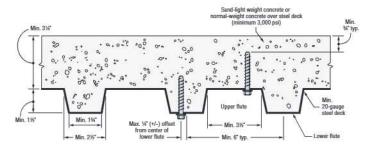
Installation of 1/4"-Diameter Anchors in the Soffit of Concrete over Steel Deck
